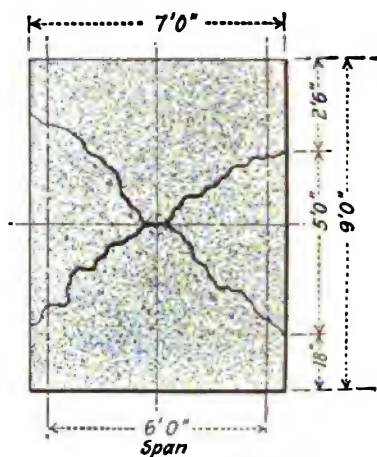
Bottom of Slab after Failure, showing Shape of Cracks.
